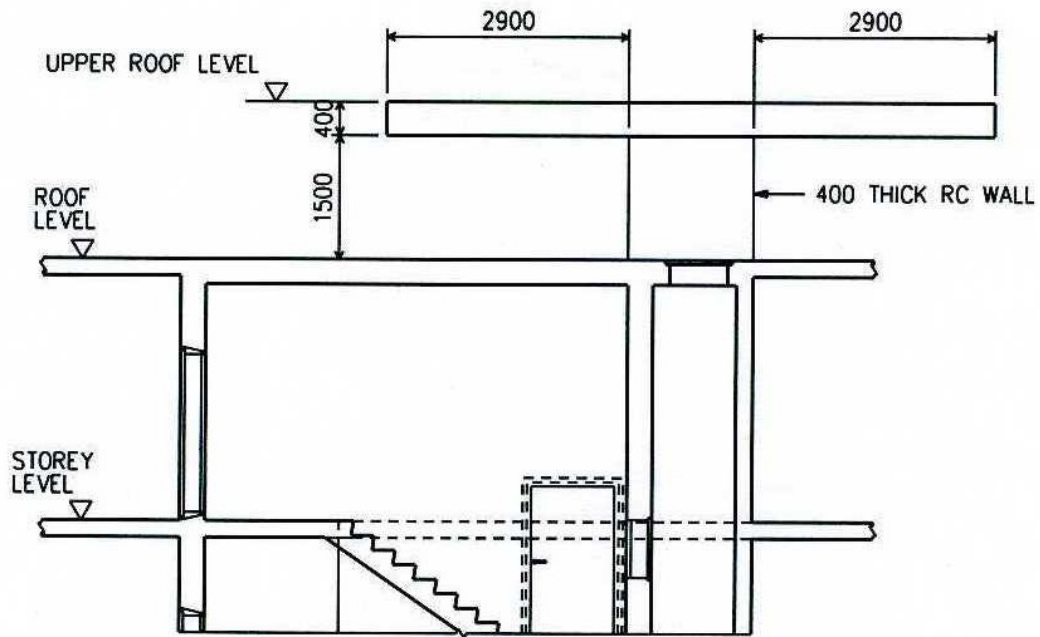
(b-3) SECTION Y - Y OF STAIRCASE STOREY SHELTER
